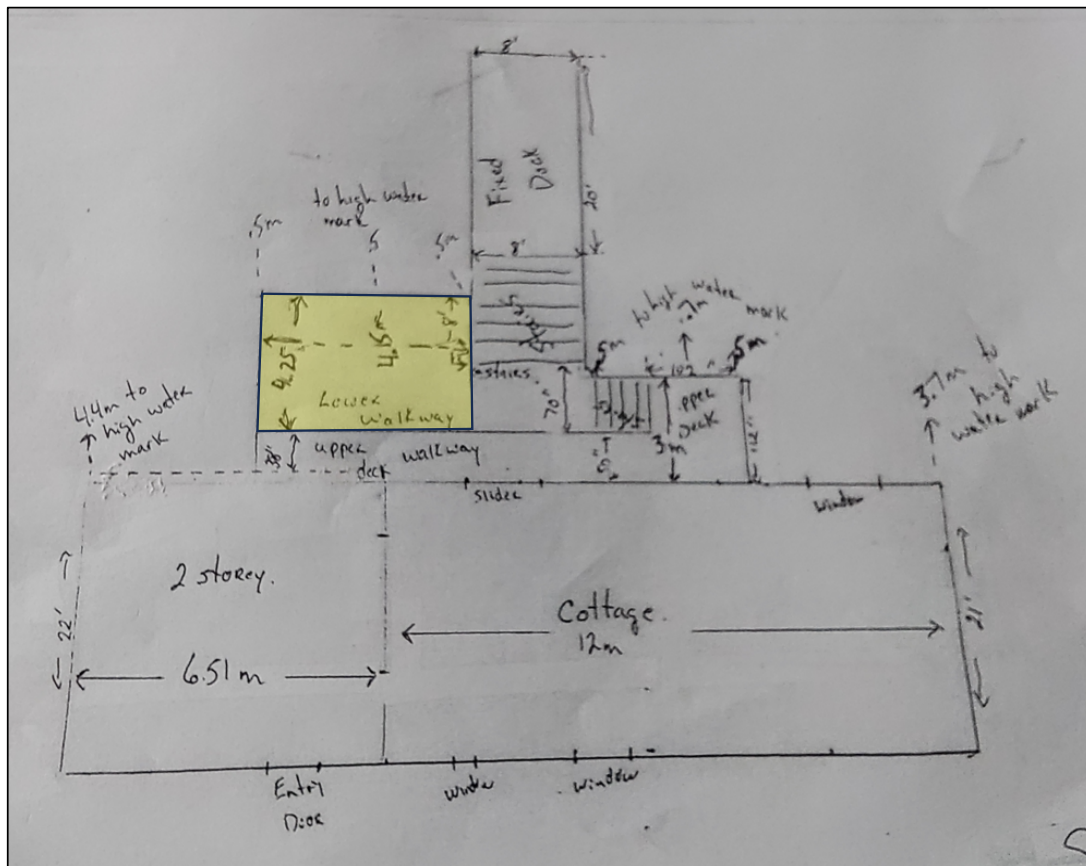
Sketch submitted by the applicant showing the existing structure and proposed additions. The measurements and setbacks shown on this sketch have been verified by Quinte Conservation Authority.
